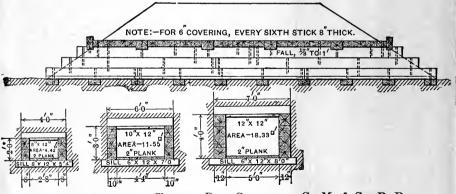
STANDARD TIMBER BOX CULVERT. C., M. & ST. P. Ry. (Feb. 1889.)
